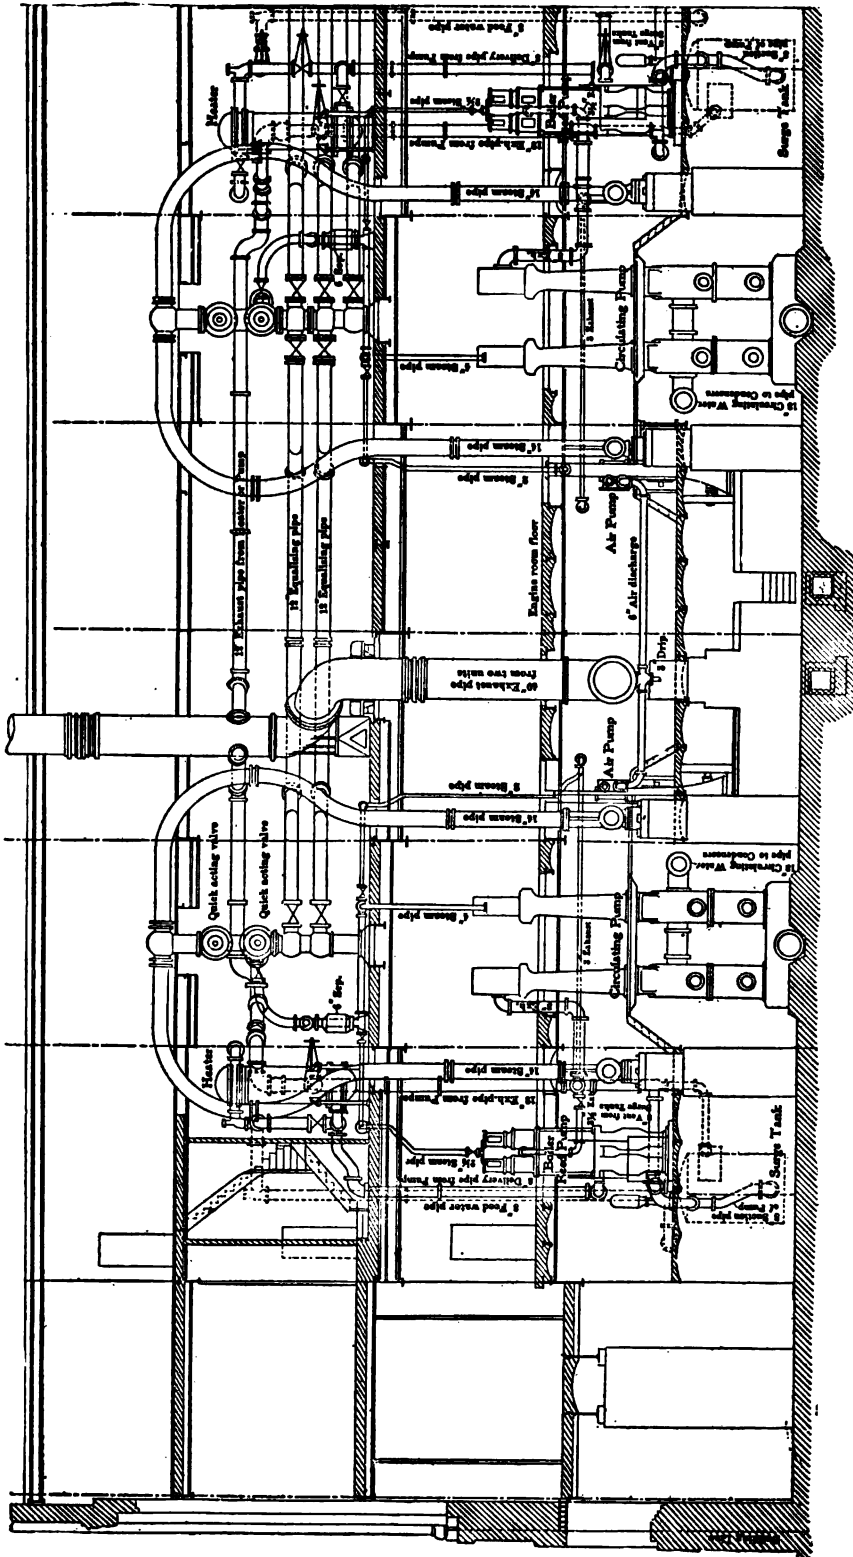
Arrangement of Pumps and Piping, 59th St. Plant, New York (*American Electrician*).
